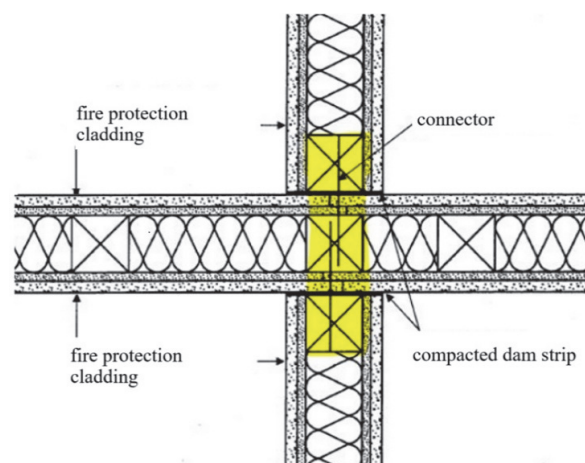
Connection of load-bearing, room-separating walls to a continuous wall with an additional stud; butt joints to continuous fire protection cladding (horizontal section)
